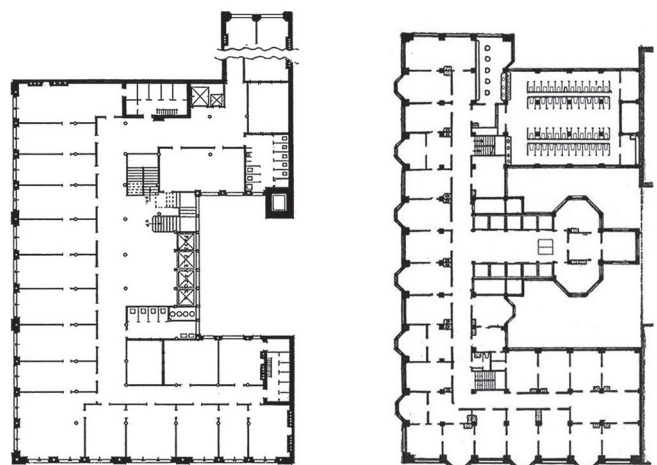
Typical floor plans of Jenney's Home Insurance Building (left) and Sullivan's Old Stock Exchange Building (right), both built in Chicago at the end of the nineteenth century (public domain).
